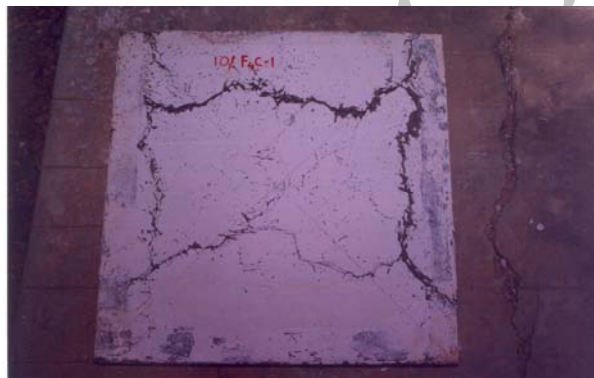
Failed specimen depicting crack pattern of SIFCON-10% fibre volume slab specimen
